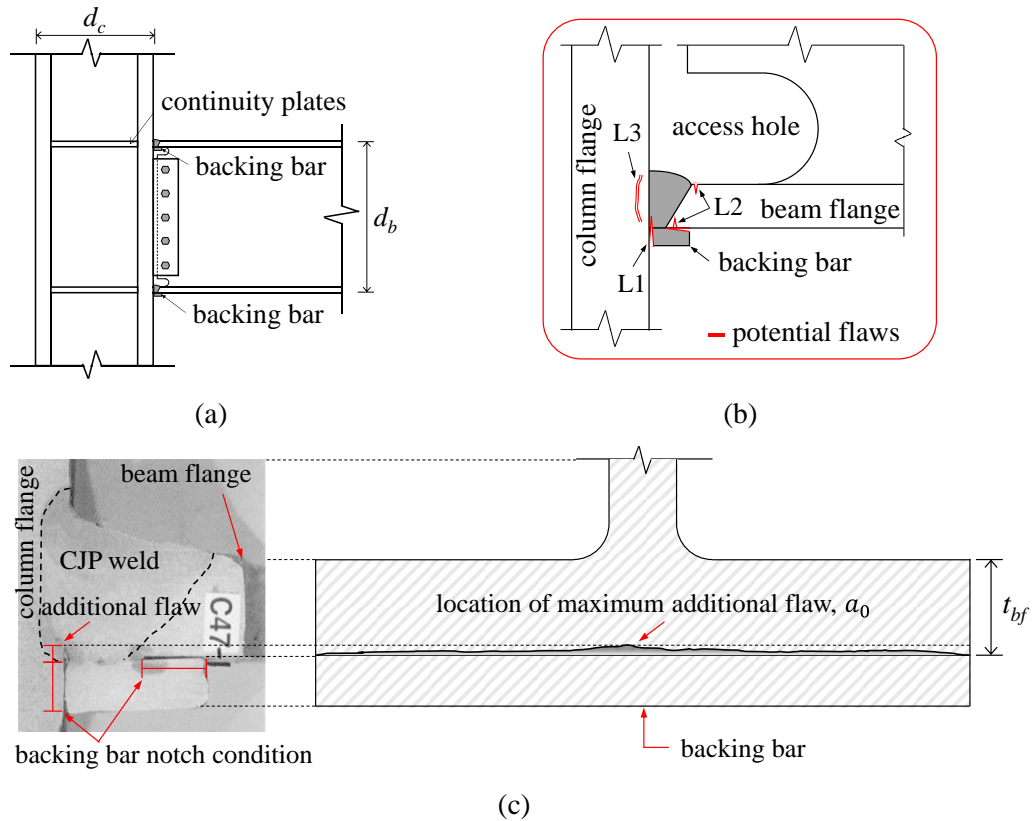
Welded unreinforced flange-bolted web (WUF-B) pre-Northridge connection: (a) typical configuration; (b) potential locations for crack initiation; and (c) typical bottom beam flange-to-column flange connection detail [adopted from (Paret 2000a), credit: Prof. J. Fisher] and schematic of additional flaw profile along the beam flange width.
